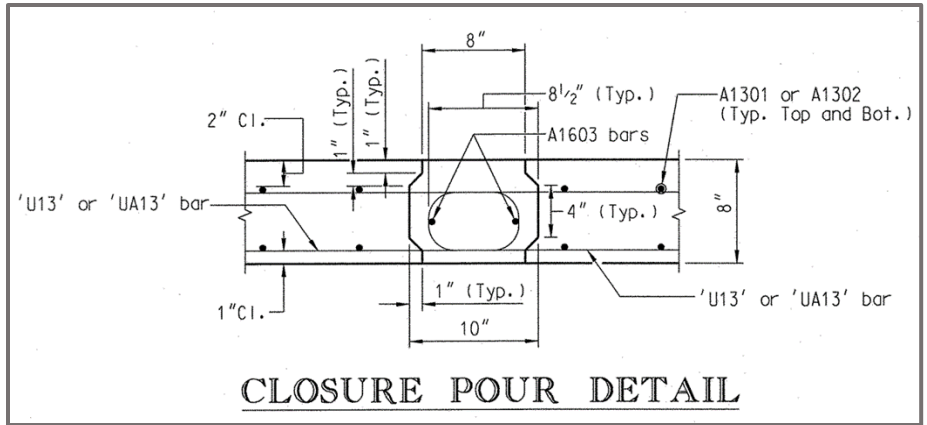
NEXT D beam connection detail with minimum 8-inch joint opening © 2018 SCDOT
